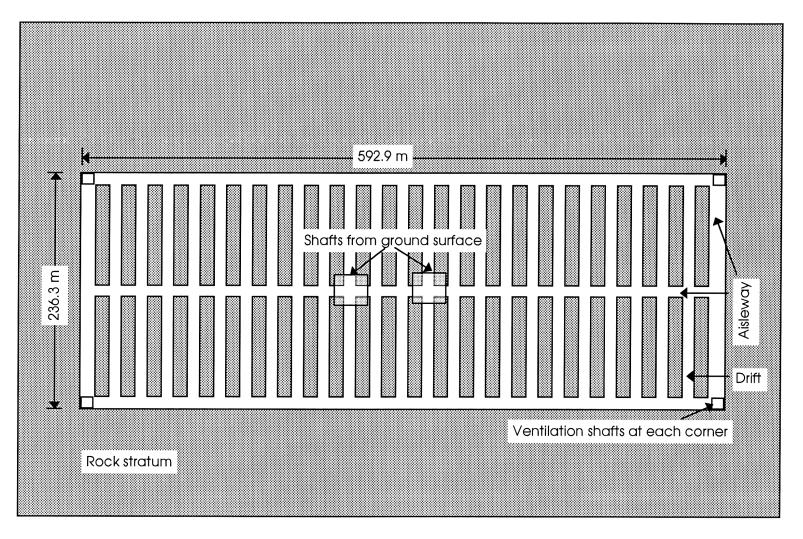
Underground Site Layout of the Mined-Cavity Storage Facility — Uranium Metal, 50% Case
